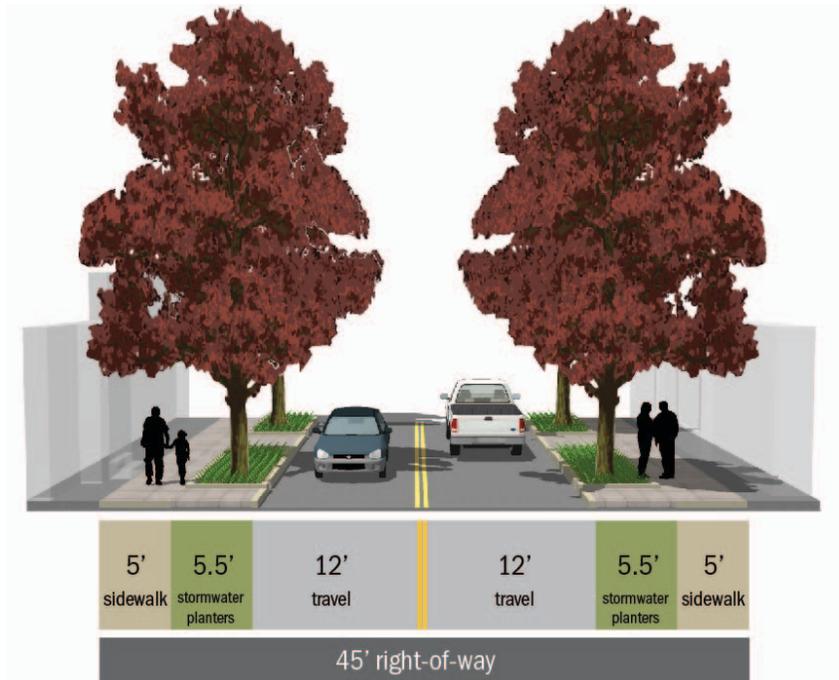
Conceptual Cross-Section for Ochoco Street – East of Main Street within existing right-of-way
